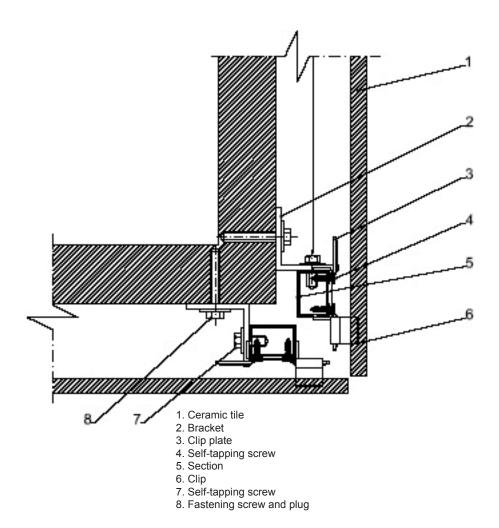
VIEW OF OPENING VERTICAL SECTION
